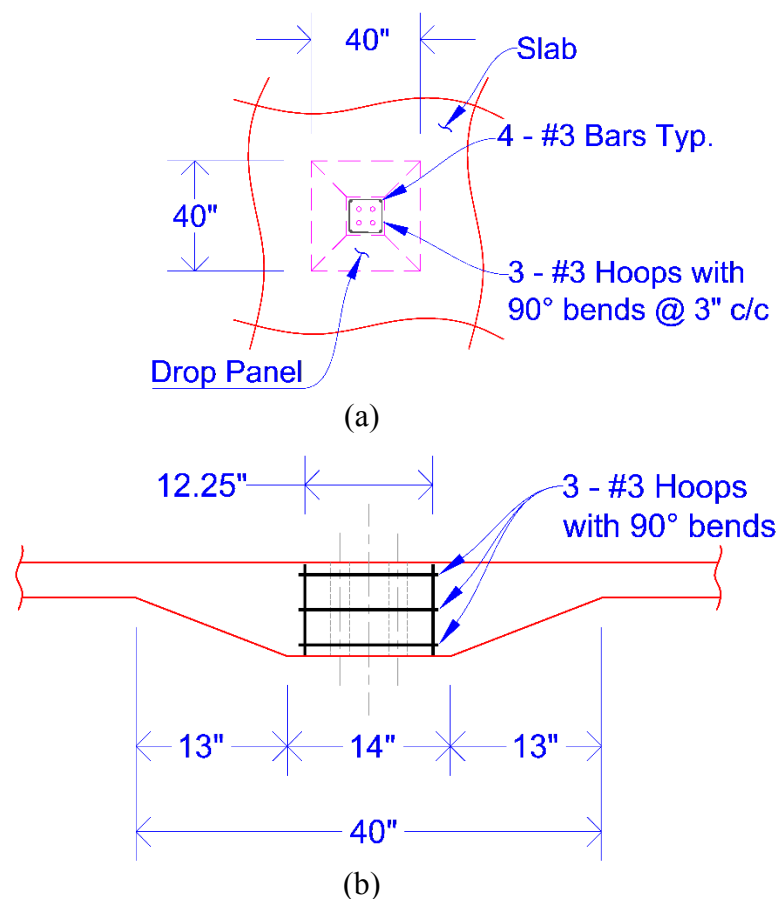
Drop panel reinforcement at support locations, (a) plan view, (b) profile view.
